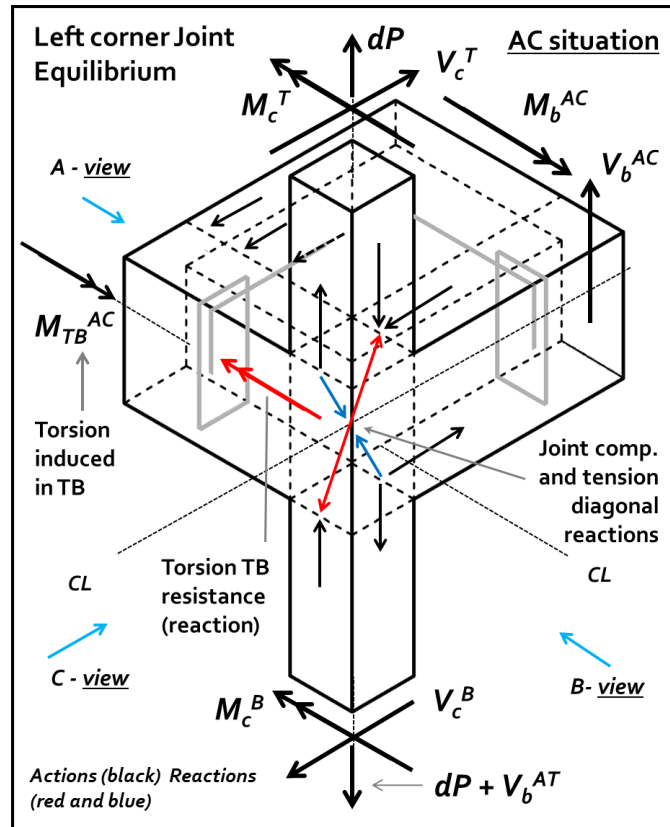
Corner beam column joint slab equilibrium and resisting mechanism.
